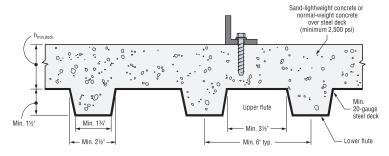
Installation of 1/4"- and 1/4"-Diameter Anchors in the Topside of Concrete over Steel Deck
